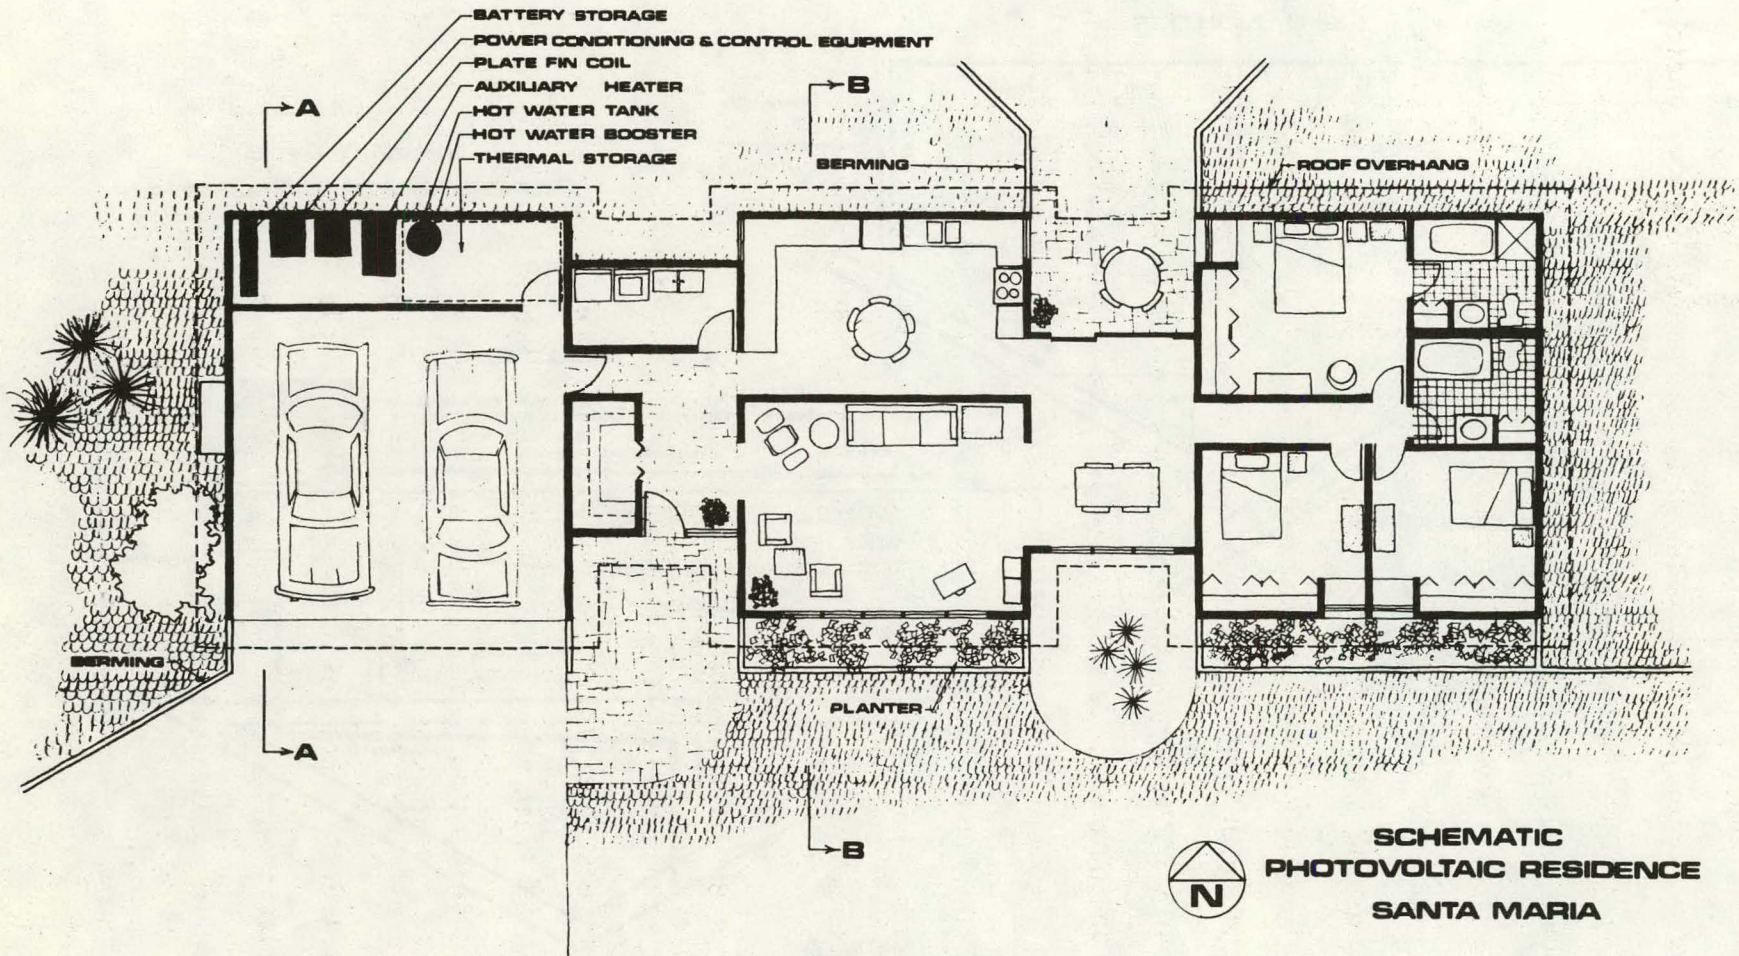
Schematic of first floor of Santa Maria residence
